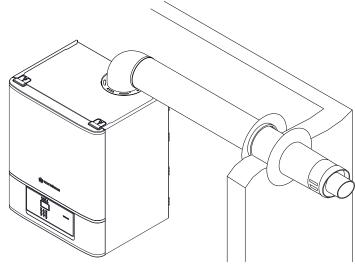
Combi concentric chimney wall outlet for hermetic use.
